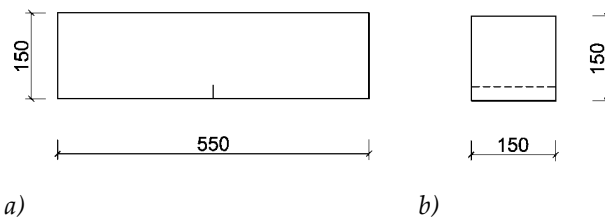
Geometry of specimens: a) longitudinal view; b) section view.
